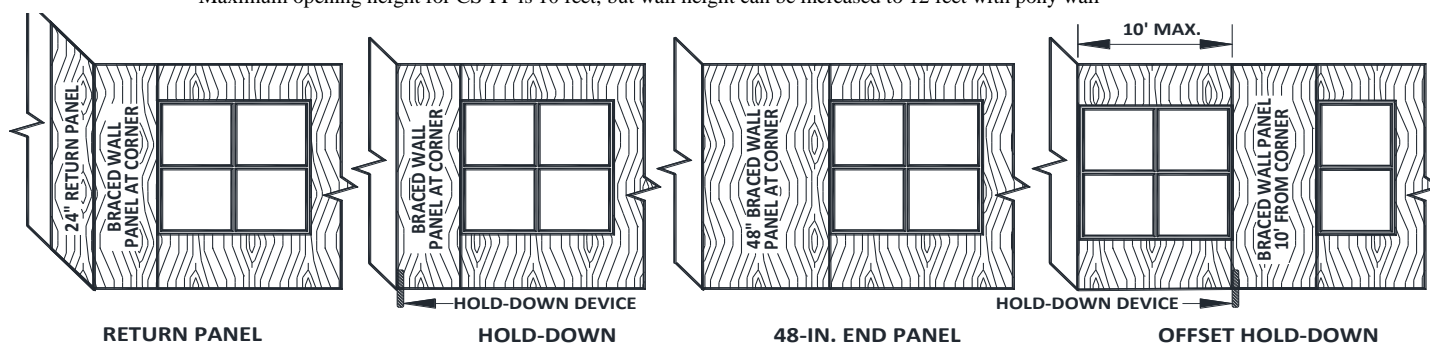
CONTINUOUS-SHEATHING CORNERS
